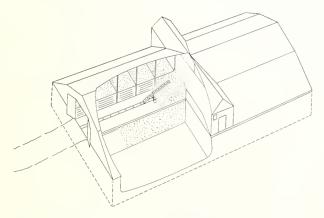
Draper chain binloader filling upper drive floor and basement alleyway.
